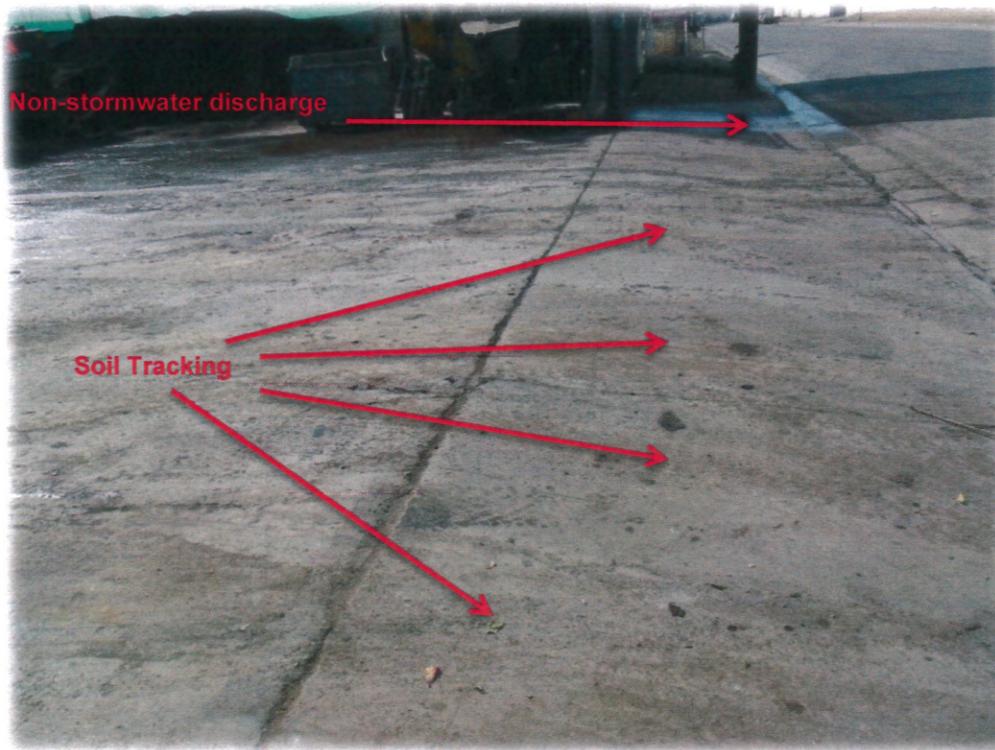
Same position as photo number 3, showing non-stormwater discharge and soil tracking onto Pendleton Street.
